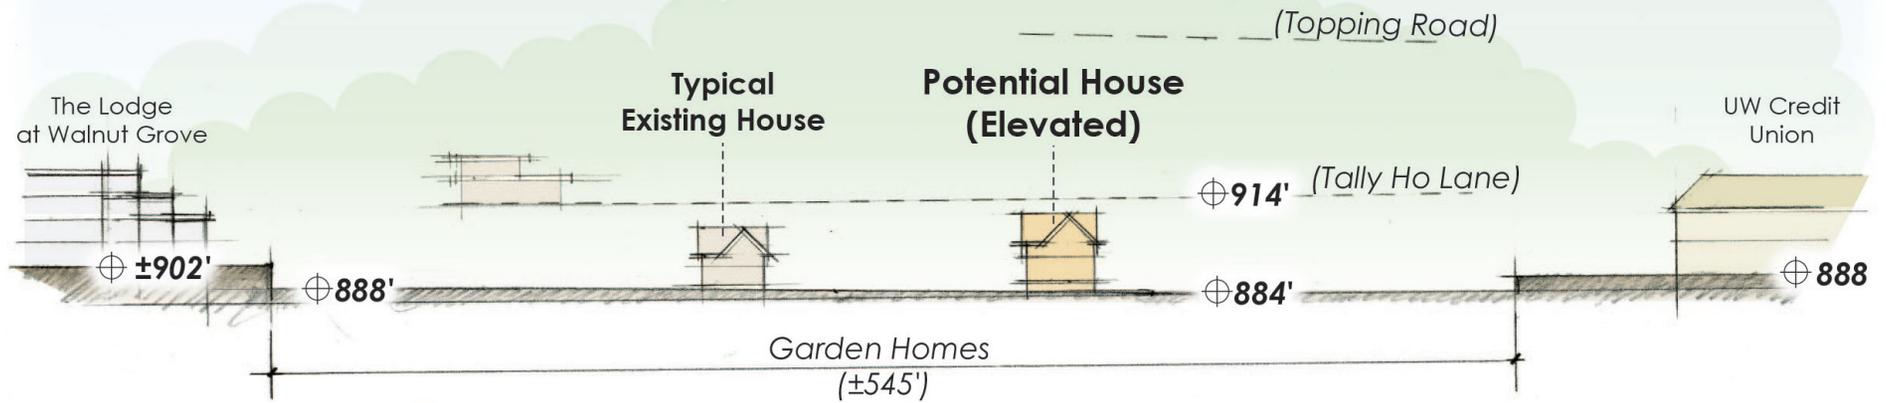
show the topographic context of the neighborhood as it exists today, and how raised structures are likely necessary to minimize property damage from future storm events. Garden Homes sits well below properties to the east and west, and views from homes on the streets to the north are unlikely to be impacted from raised foundations or even potential new mid-rise (2-4 story) development in the Study Area.
